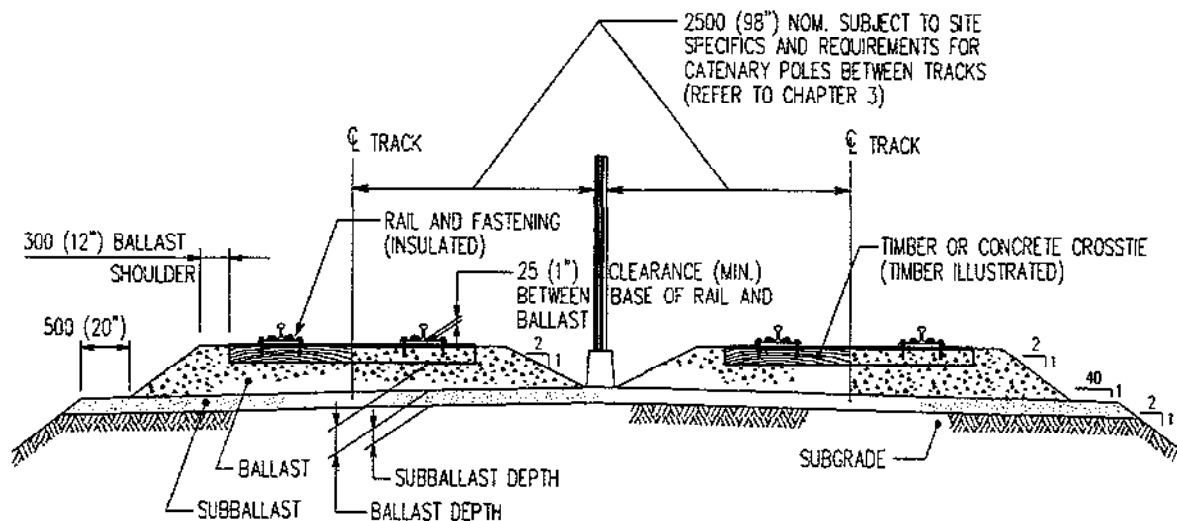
Ballasted Double Track, Tangent Track (Timber Crosstie)
